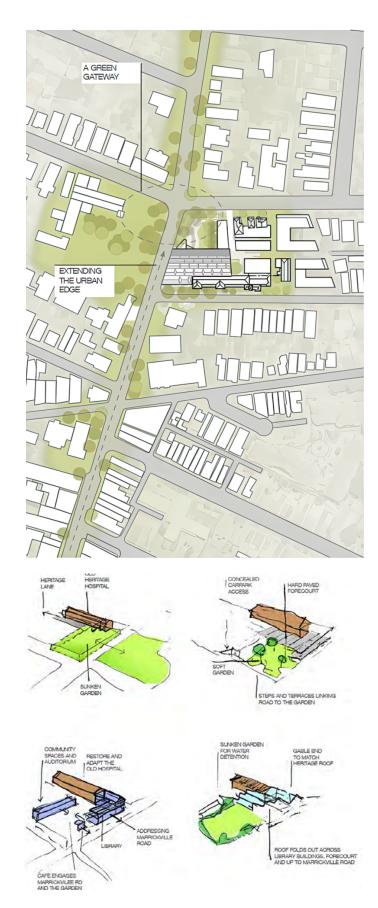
Location on corner of Marrickville Road and Lilydale Street, and concept axonometrics looking east. (Images: BVN)
